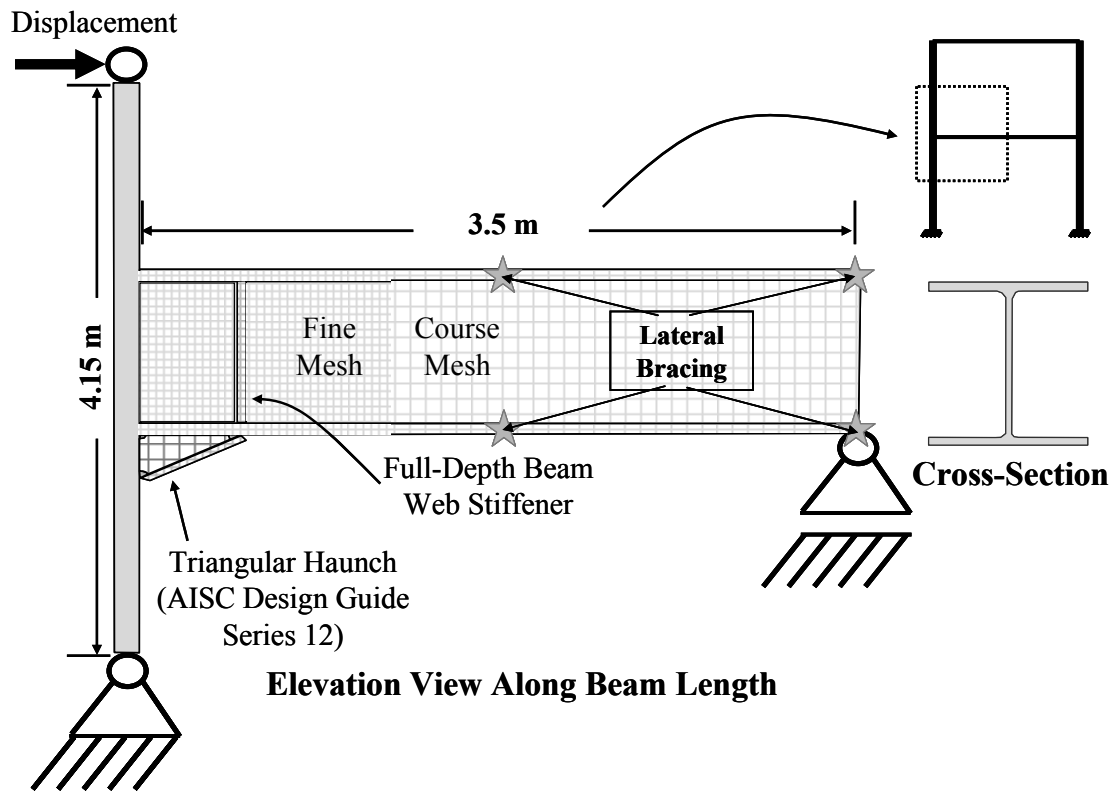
Half Span Beam Model with Welded Haunch Modification
